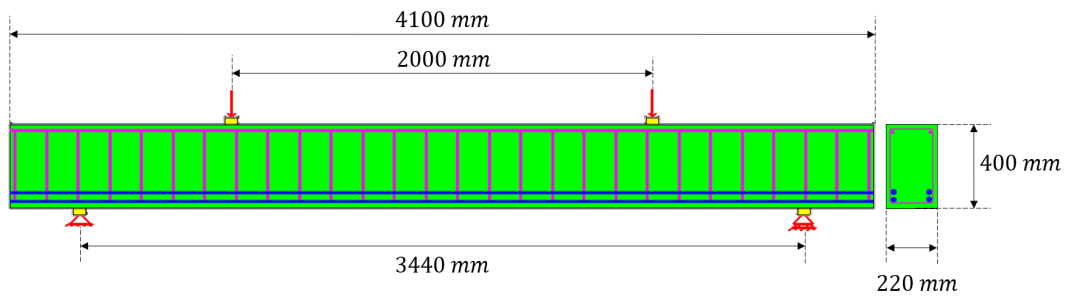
Beam designed following MC2010 recommendations: (i) green: concrete material, (ii) blue: tensile longitudinal rebars and (iii) pink: stirrups and compressive longitudinal bars
